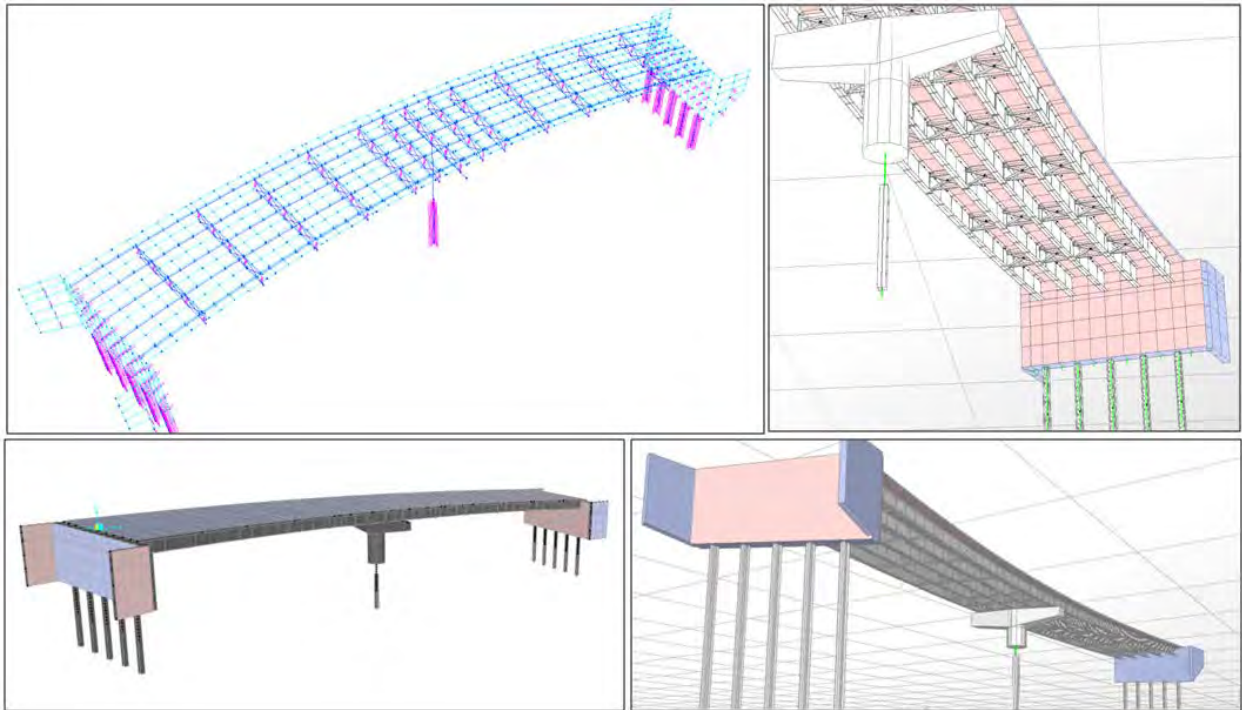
Finite Element Modeling of Stockbridge Bridge
